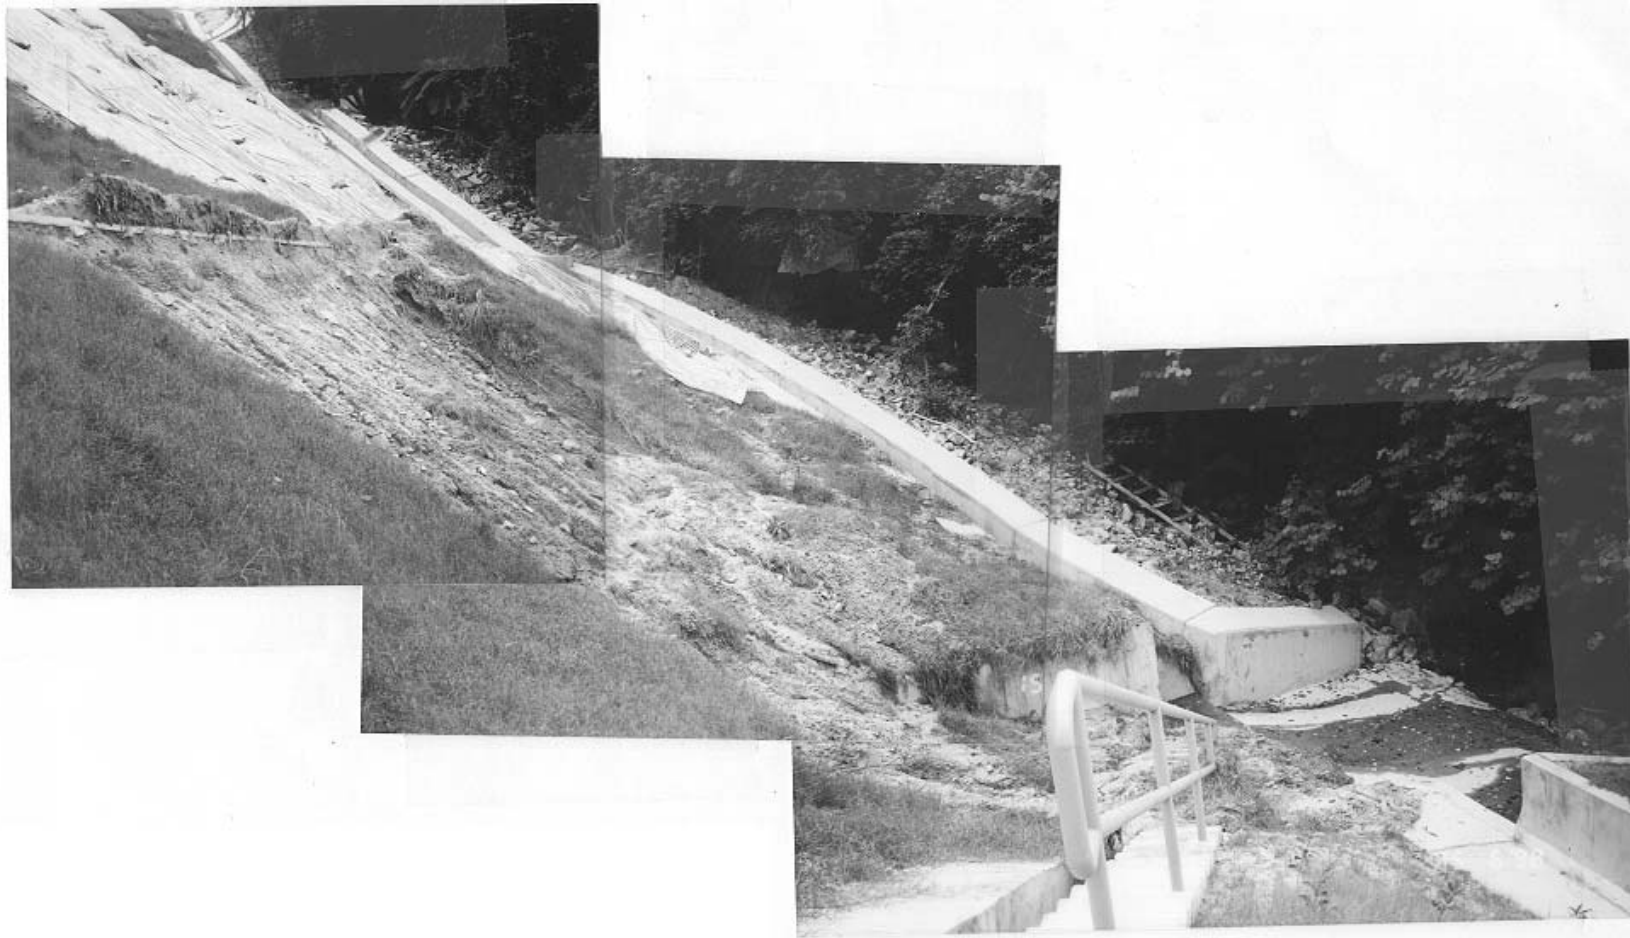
Event No. 3: 9 June 1998. View North from 34.5 mPD Berm Towards New Failure in Batter Below 37.5 mPD Berm.
